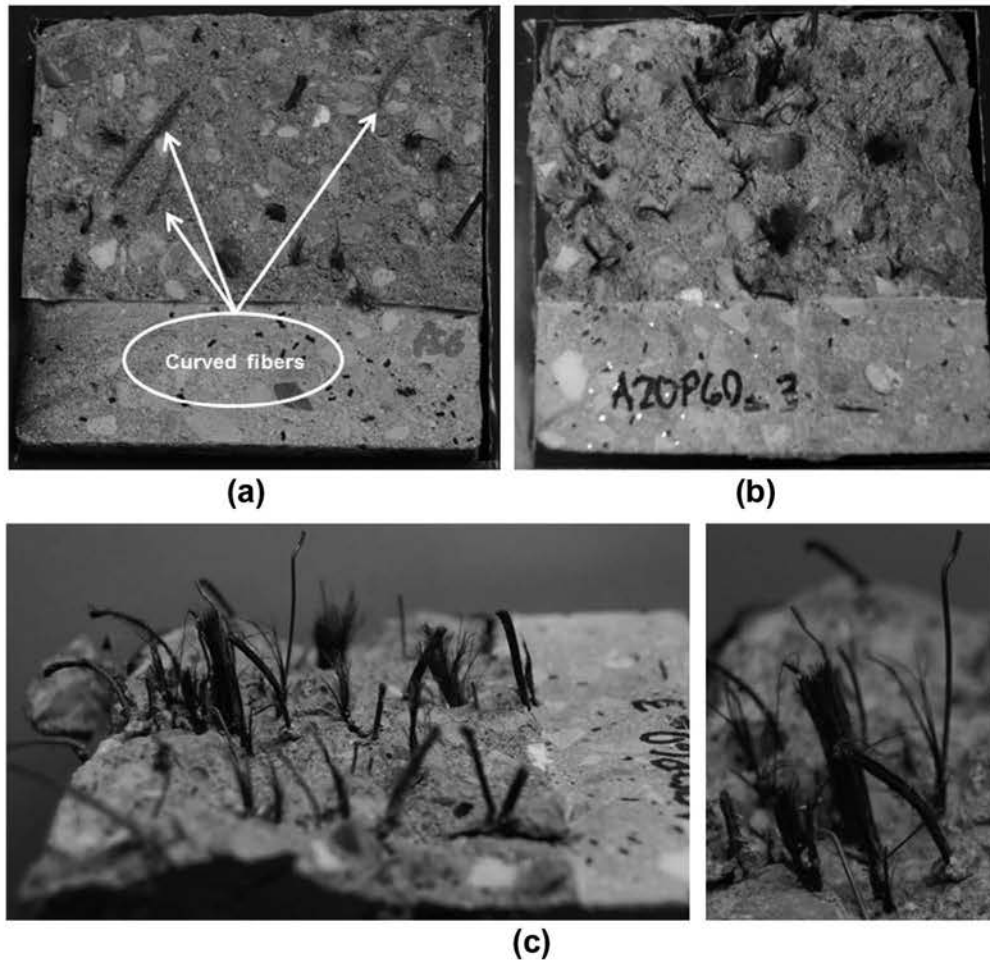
Hybrid FRC improved fiber orientation of polyolefin fibers: (a) fracture surface of a P66 specimen; (b) fracture surface of a H2 specimen; (c) profile of a hybrid FRC (H2).
